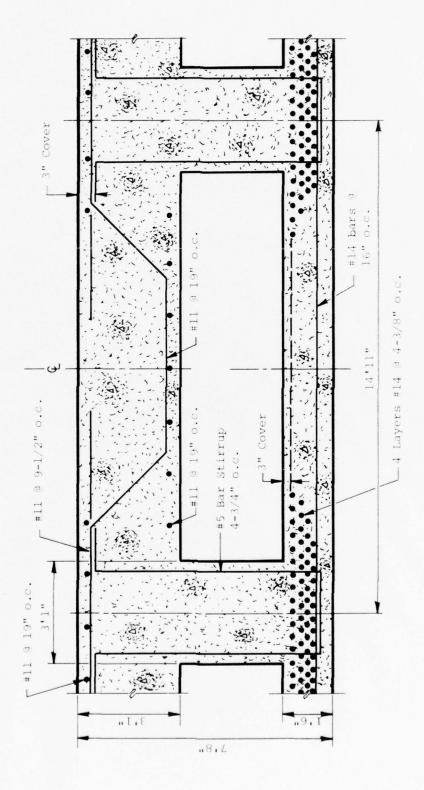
Box Girder for 100-Foot Span 1000 psf Surcharge
